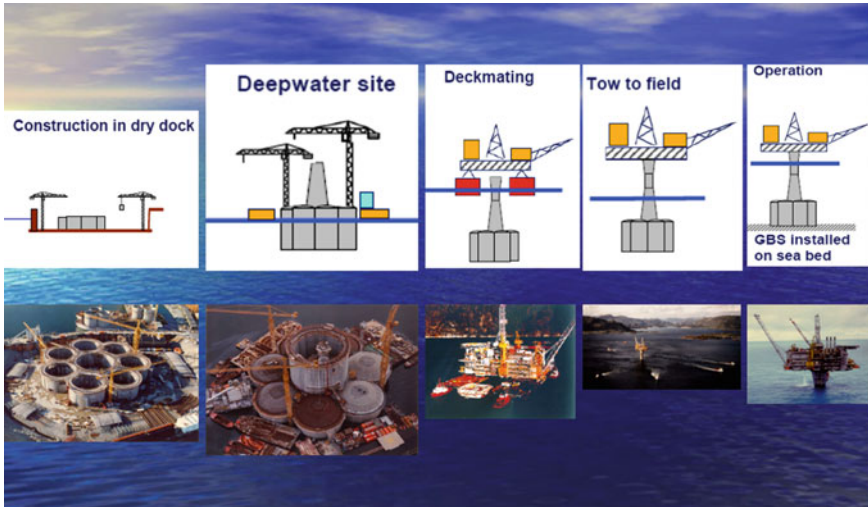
Principles of constructing large marine concrete structures. The Draugen Platform is the example here. First dry dock, so float out and completion before deck mating. The deck is built in parallel with the concrete structure. Finally tow out, installation and production of, in this case, oil
